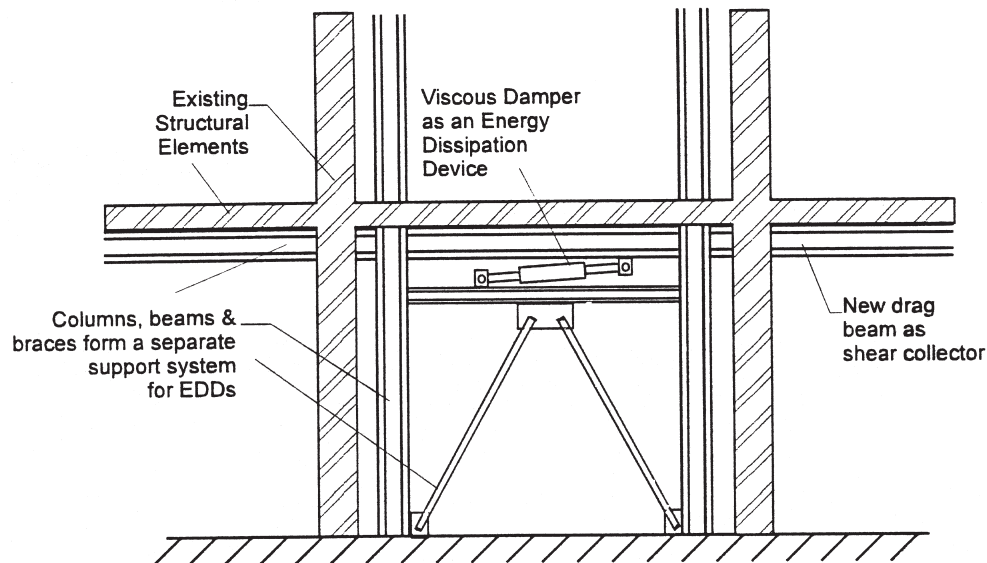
Schematic of a typical arrangement of damper and supporting structure.
